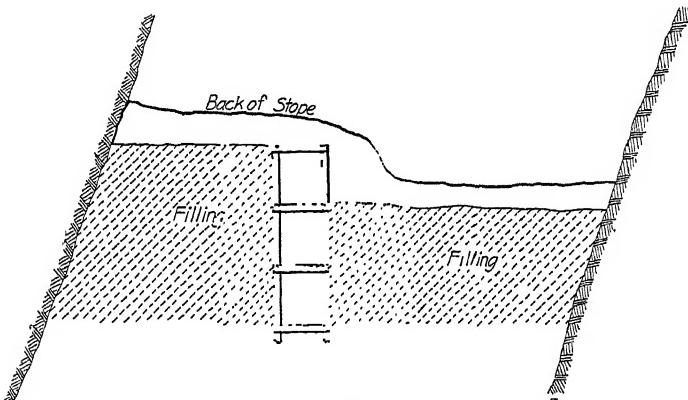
OPEN STOPE IN TWO FLOORS WHERE HANGING WALL IS WEAK.
